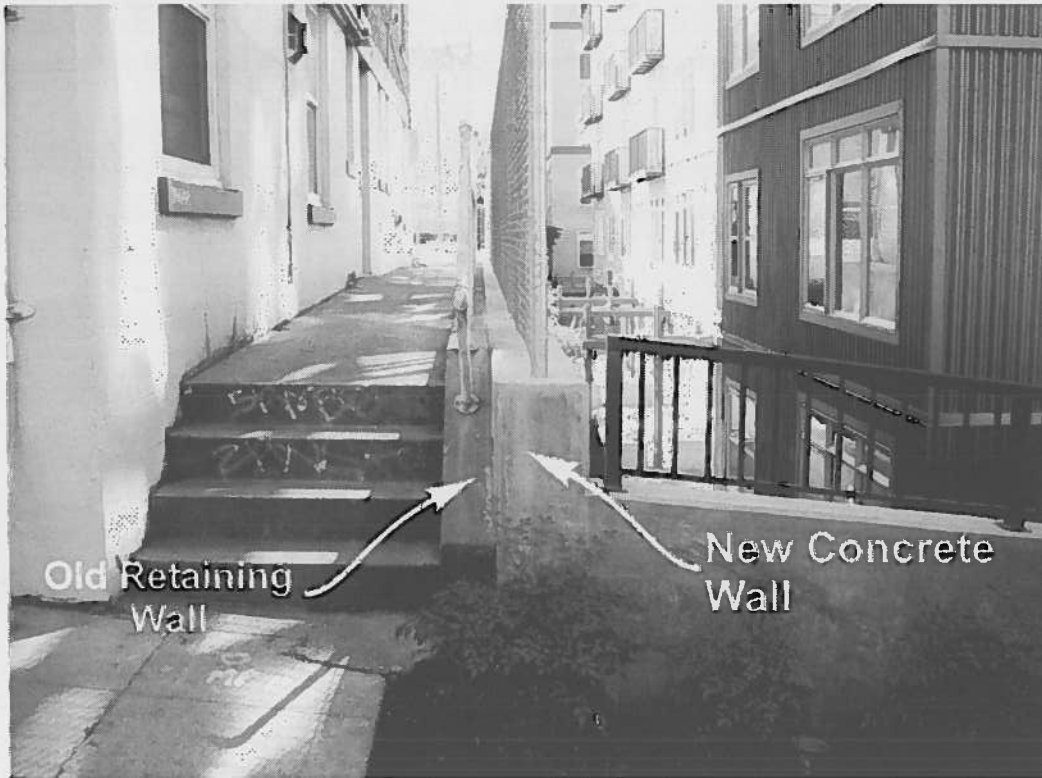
Older Concrete Retaining Wall With The New Concrete Wall Adjacent To The Completed Press II Apartment Building.
